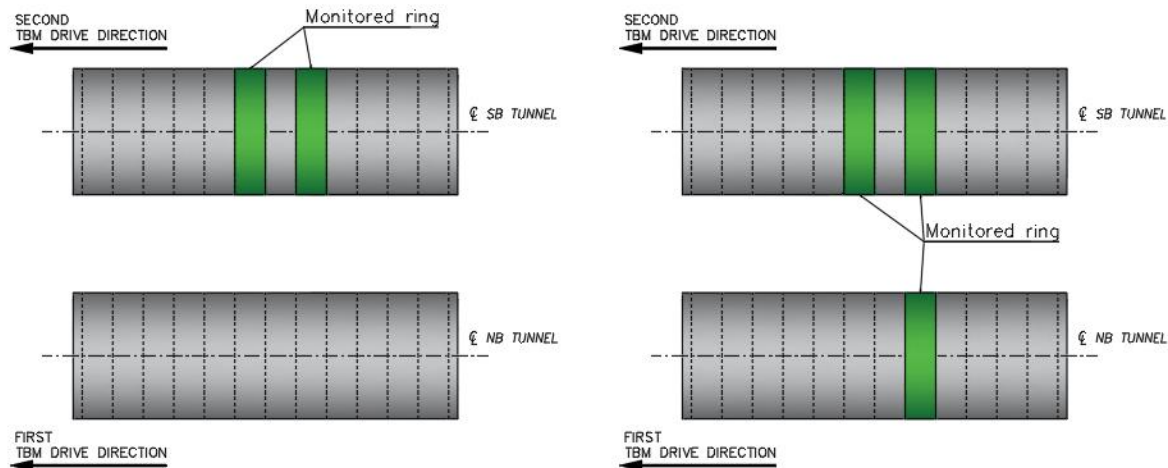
Instrumented rings marked in green at the two cross section, on the left cross section 1 and on the right cross section 2
